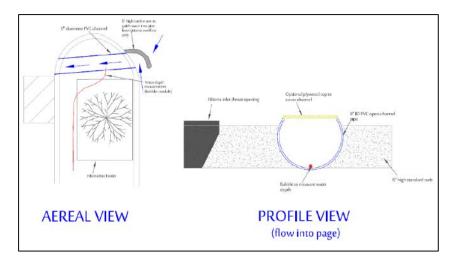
Plan and cross section of the overflow pipe for bypass monitoring
